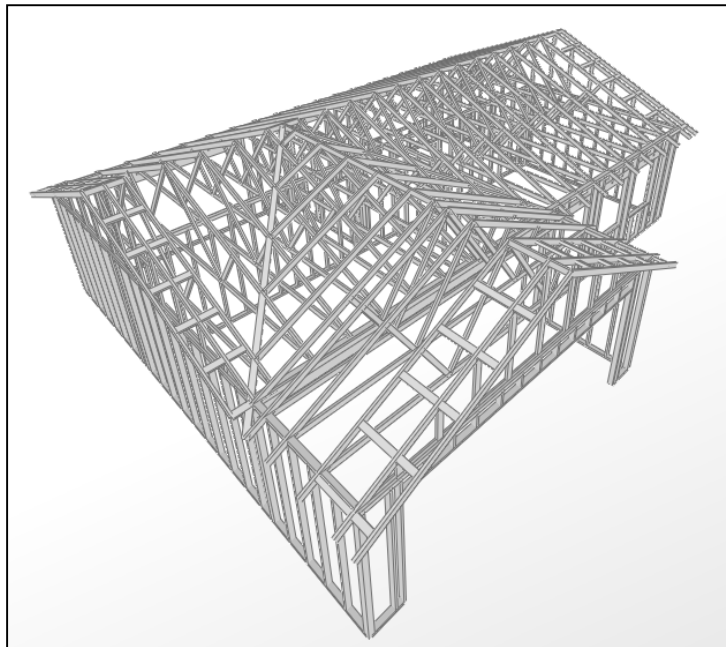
L-Shaped Index House for Wind Load Investigation – Paevere (2002) house with modified gable-end framing, anchor bolt spacing and addition of hold-downs as described previously. Walls and gable-ends are fully sheathed on the exterior with plywood.
